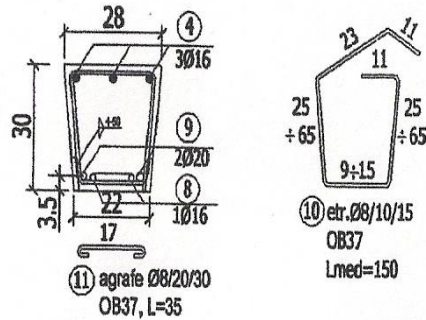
a)-Cross section of the roof beam –superior zone (1)-
